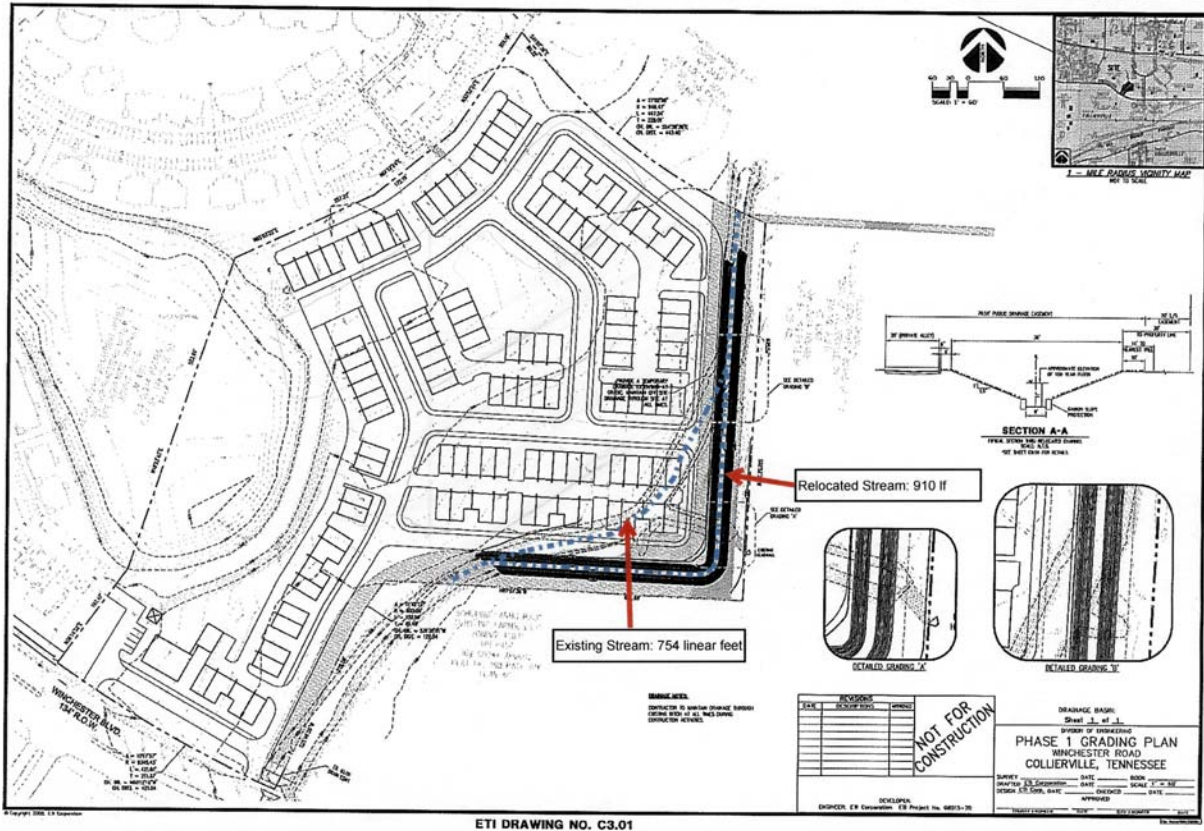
Plan view indicating existing 745 linear foot channel and proposed 910 linear foot channel.
